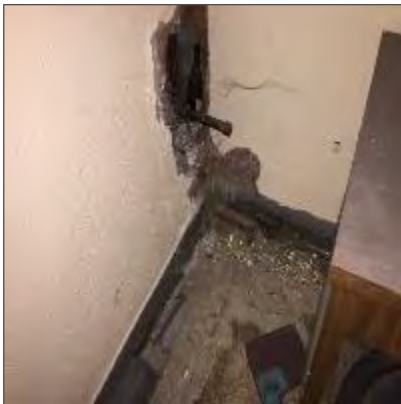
Damaged asbestos-containing plaster and debris, McMaster Wing Basement below stairs near Mechanical Room.
